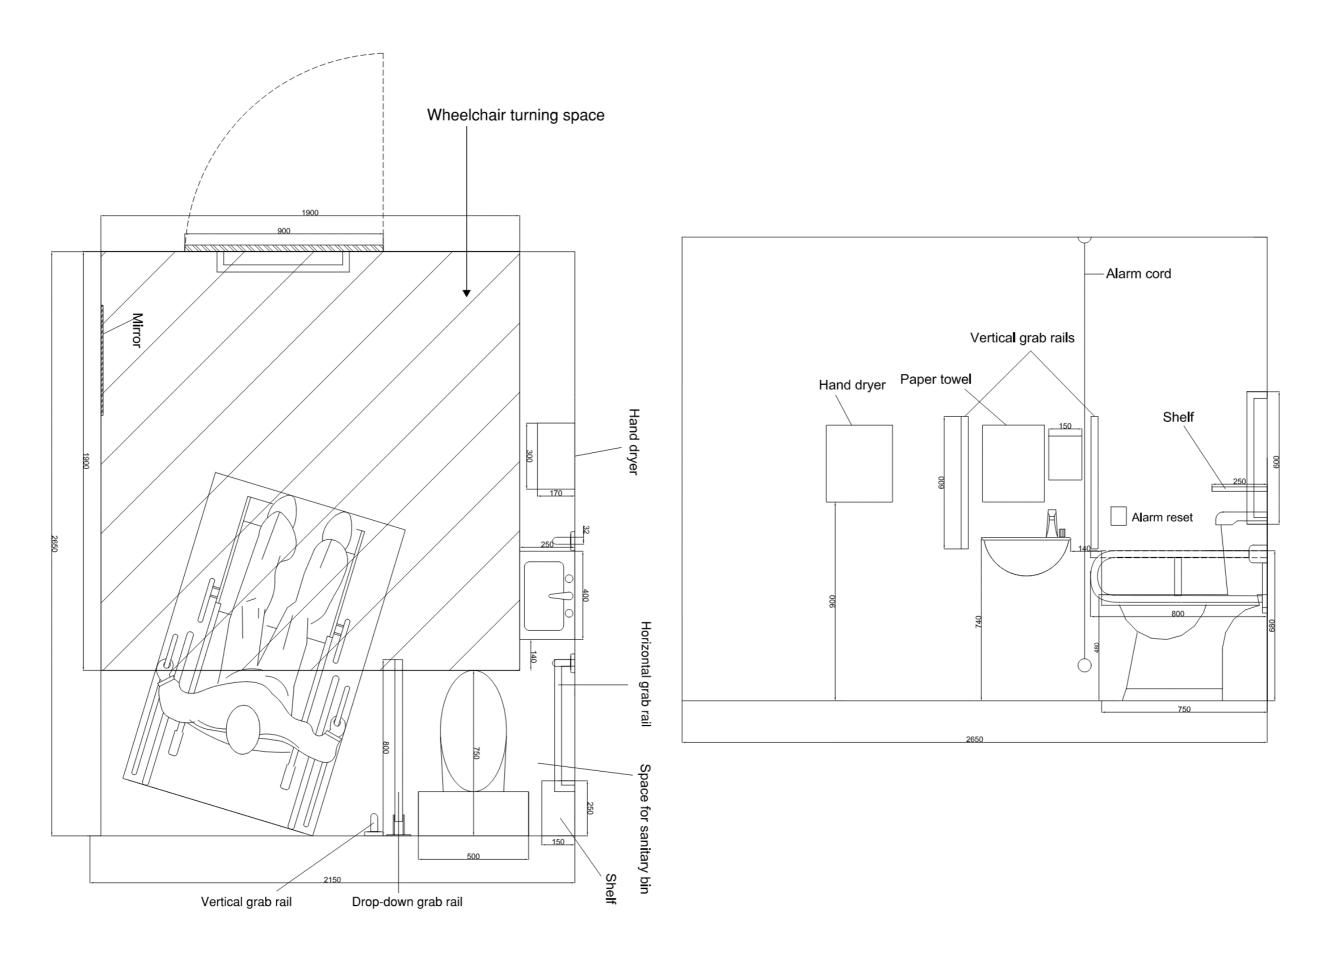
Indicative drawing for a wheelchair-accessible toilet facility for independent use (plan and elevation)
